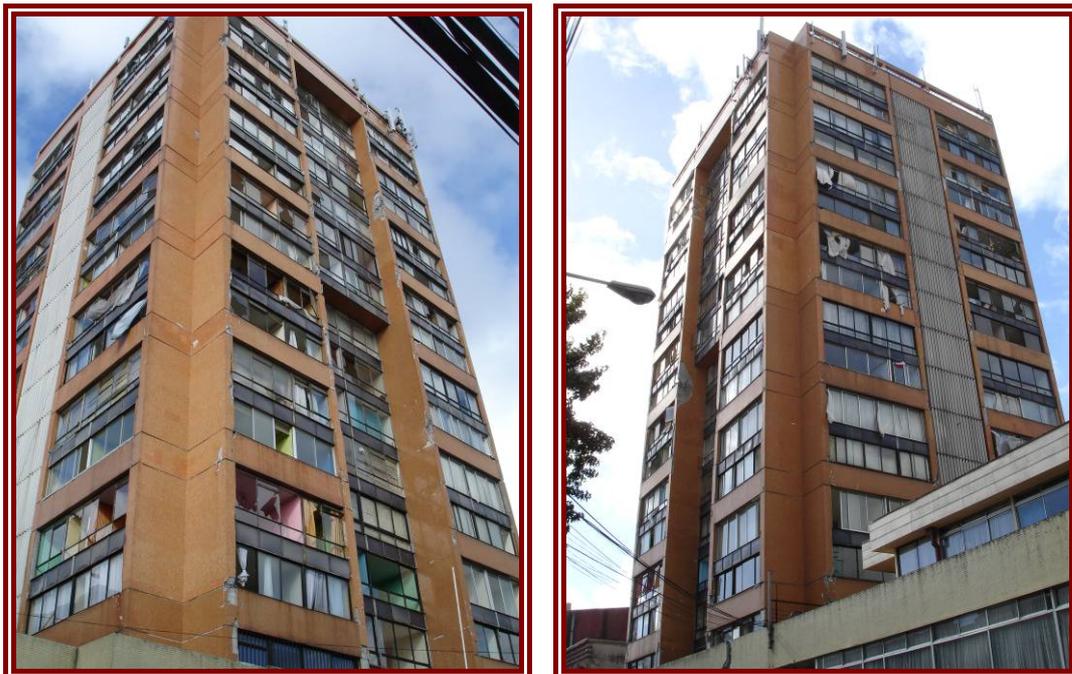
Damage to beam column joints over the full height of Lincoyan 440
